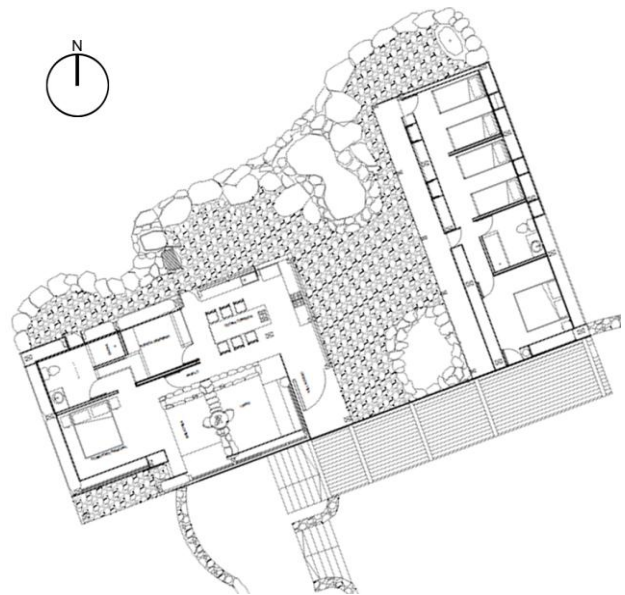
Plan of case study house, Caleu, Metropolitan Region, Chile. Timber post and beam structure with straw bale infill.
